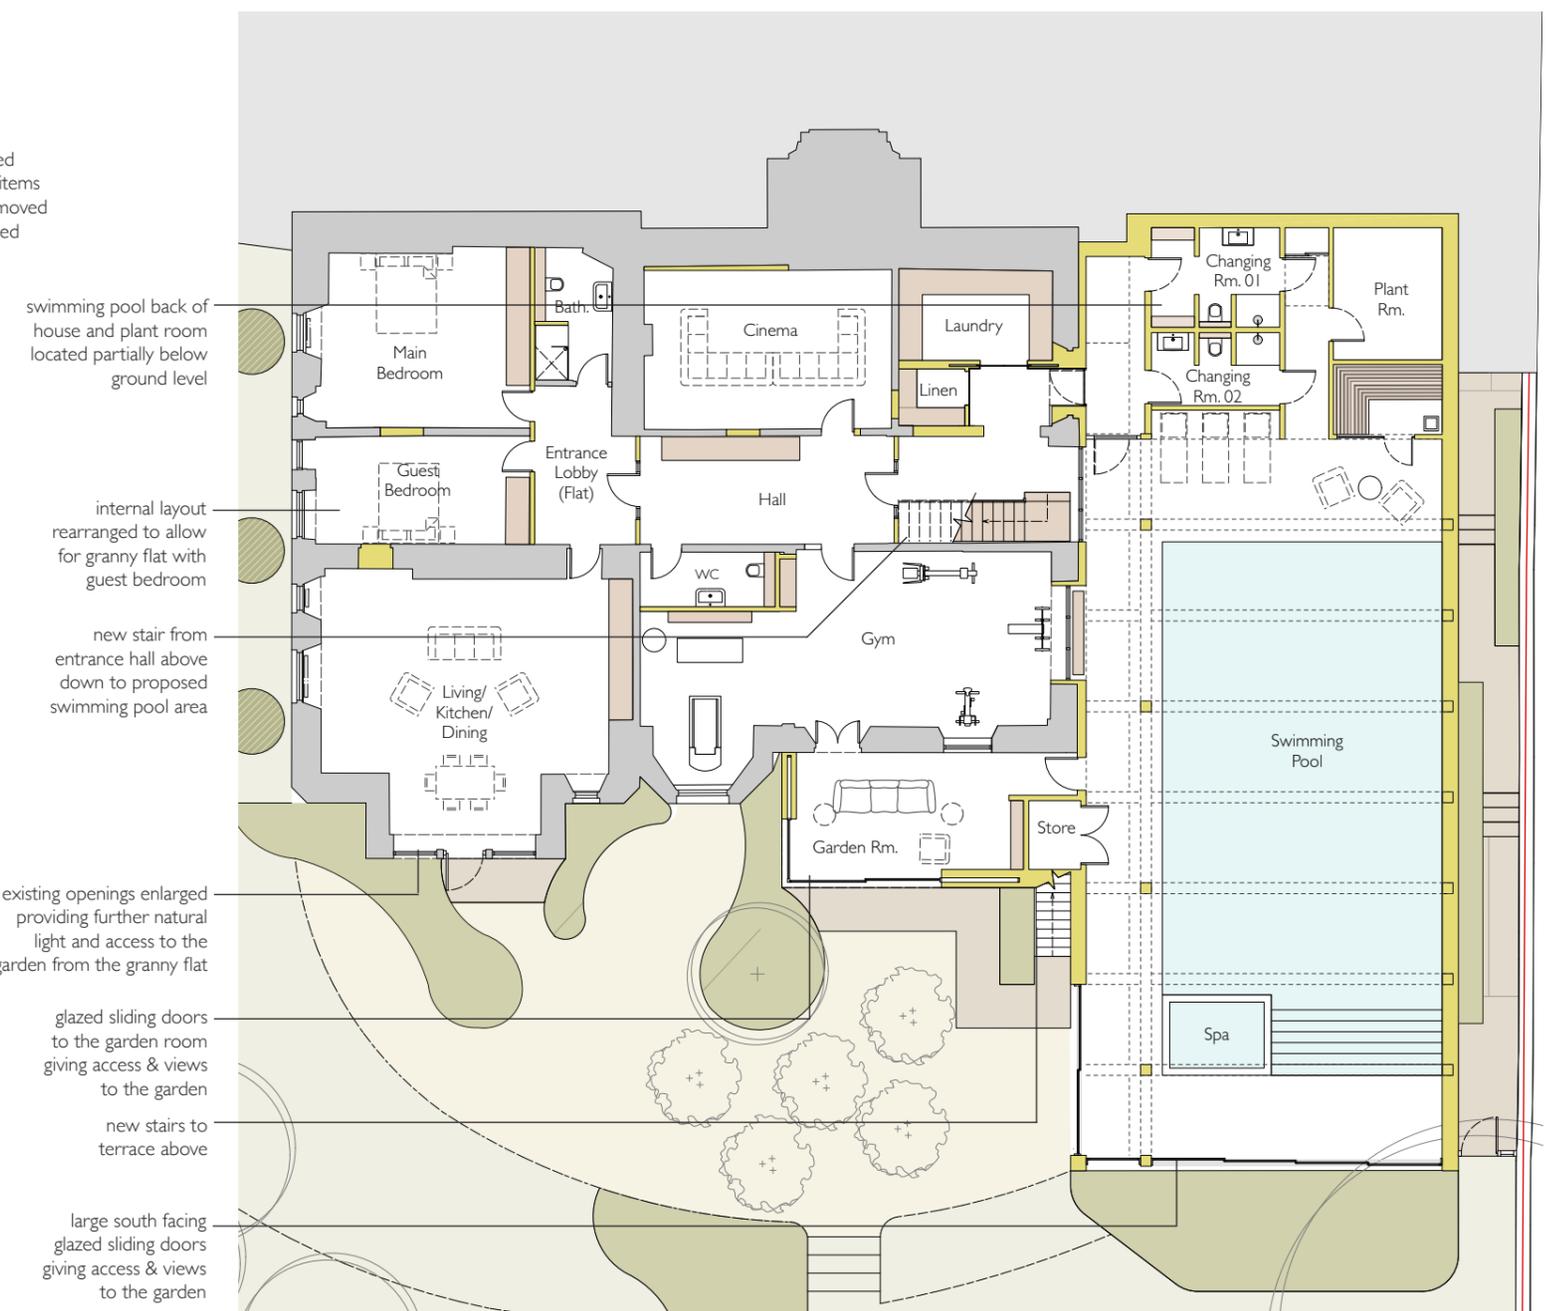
Proposed Lower Ground Floor Plan
